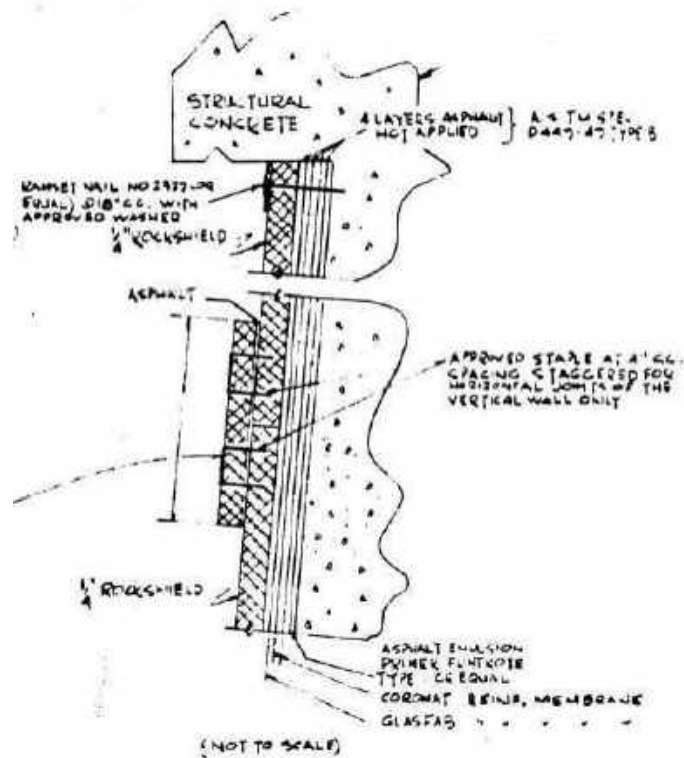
Lulu and Deas Approach Waterproofing Details from Drawing 6J-1158.
